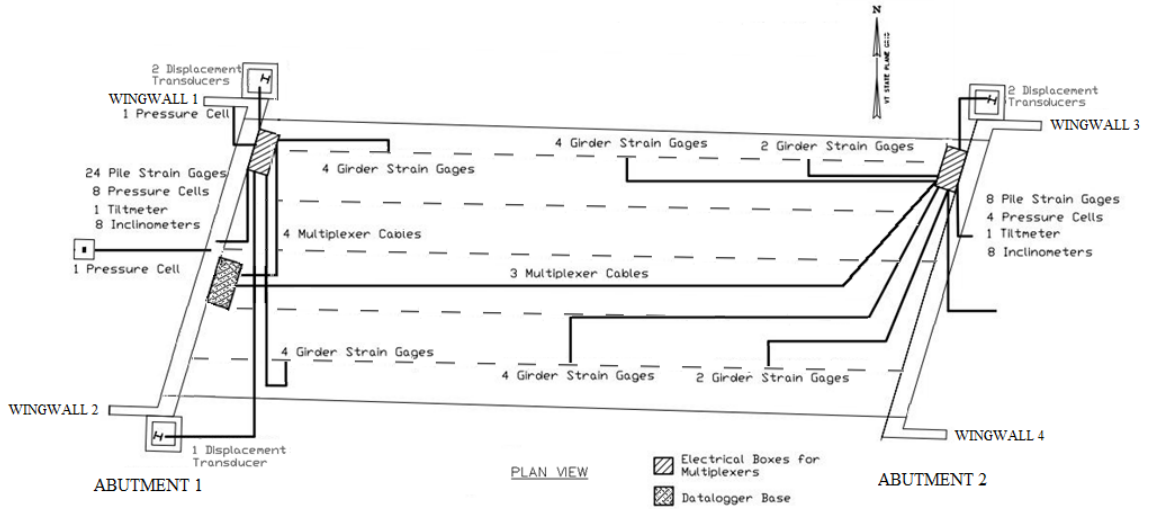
Overview of Instrumentation in East Montpelier Bridge
